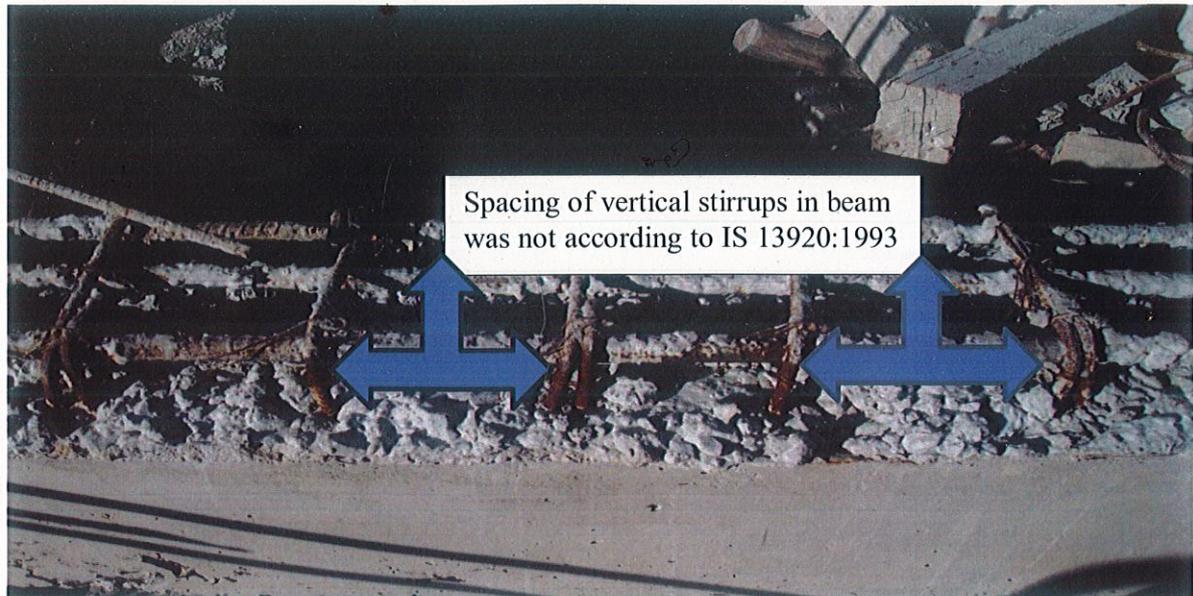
, COLLAPSED BUILDING NEAR WAKNAGHAT
